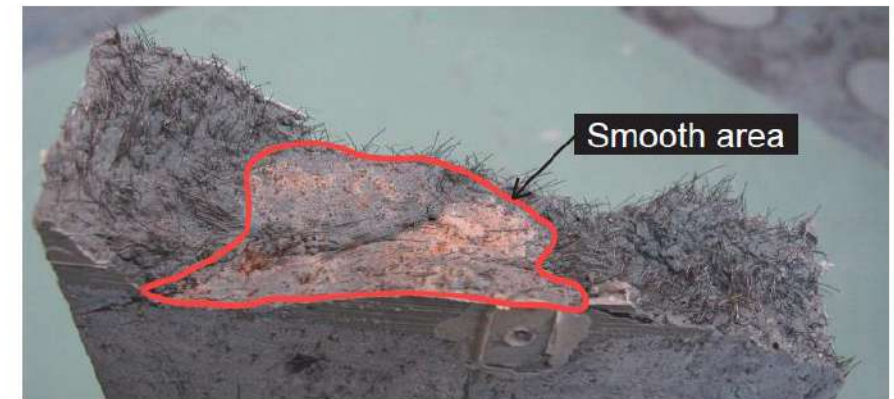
Smooth area of fatigue fracture surface of UHPFRC
